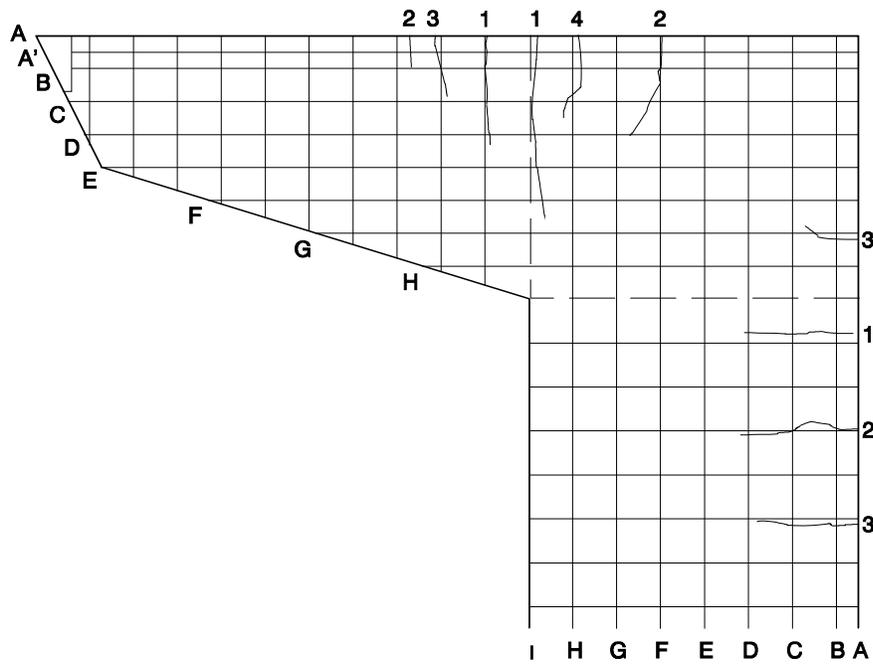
Cracking patterns on south face of Specimen POJ-PU-74-TH at service load
